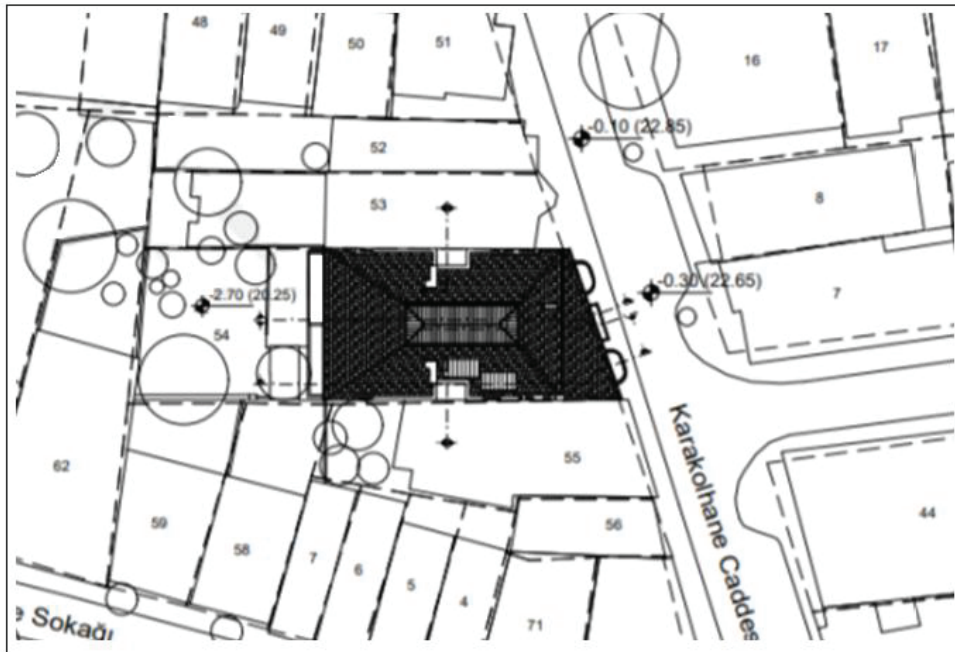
Site Plan of Tevfik Tura Apartment. (Source : Tunçer 2016)
